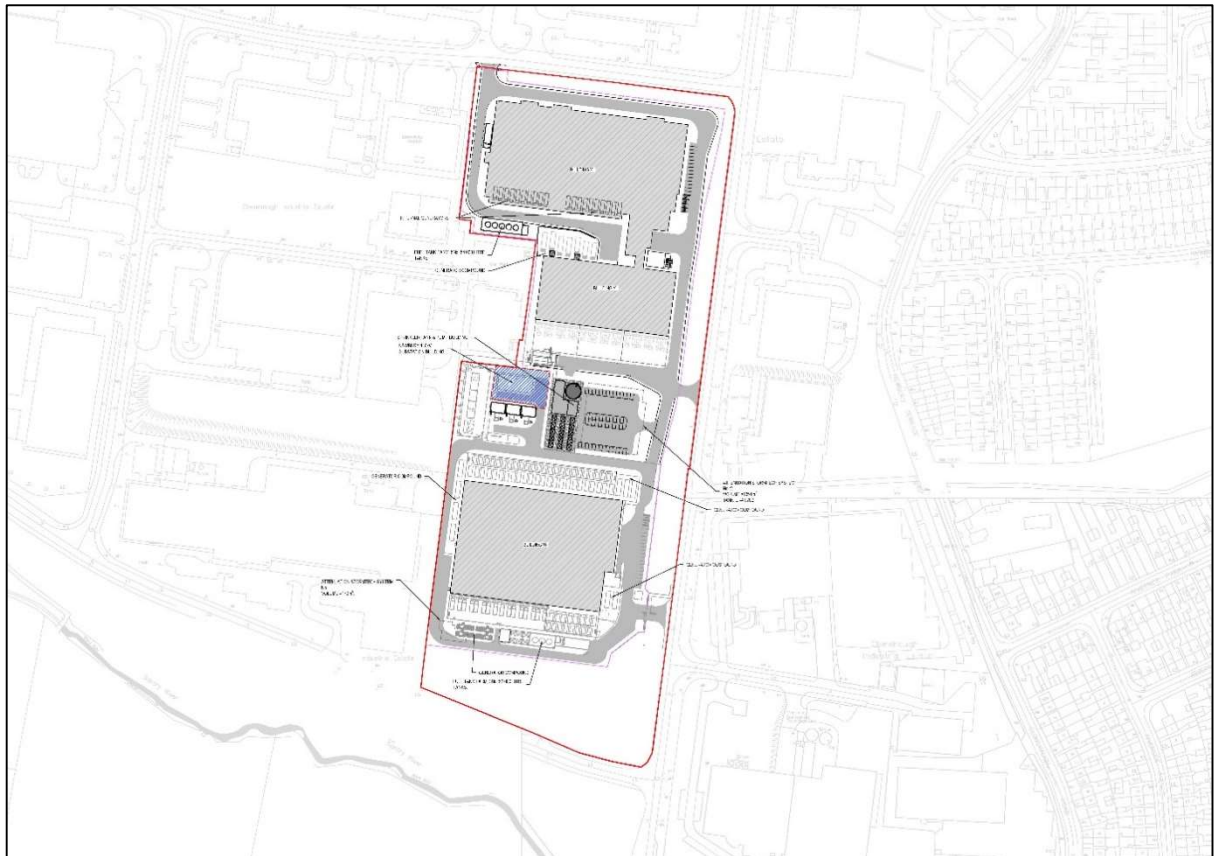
Site Layout (existing Installation refer to Drawing 21_123F-CSE-00-XX-DR-C-0002 - Site Layout Plan
